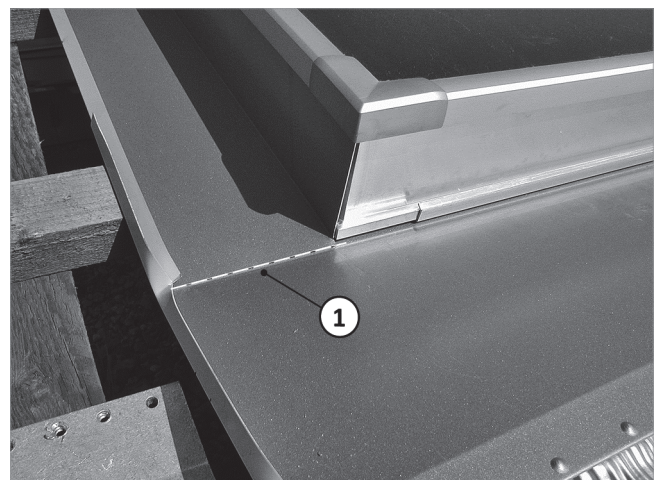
Sliding the lower side flashing down until it reaches the bend
